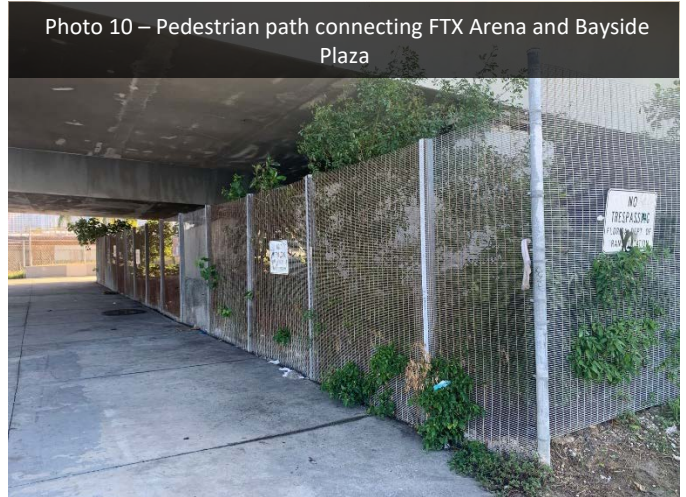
Pedestrian path connecting FTX Arena and Bayside Plaza
